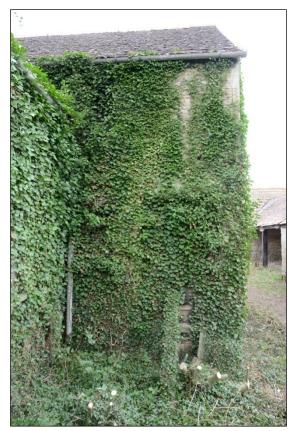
Window in the east wall of Building 5B, looking west-southwest
